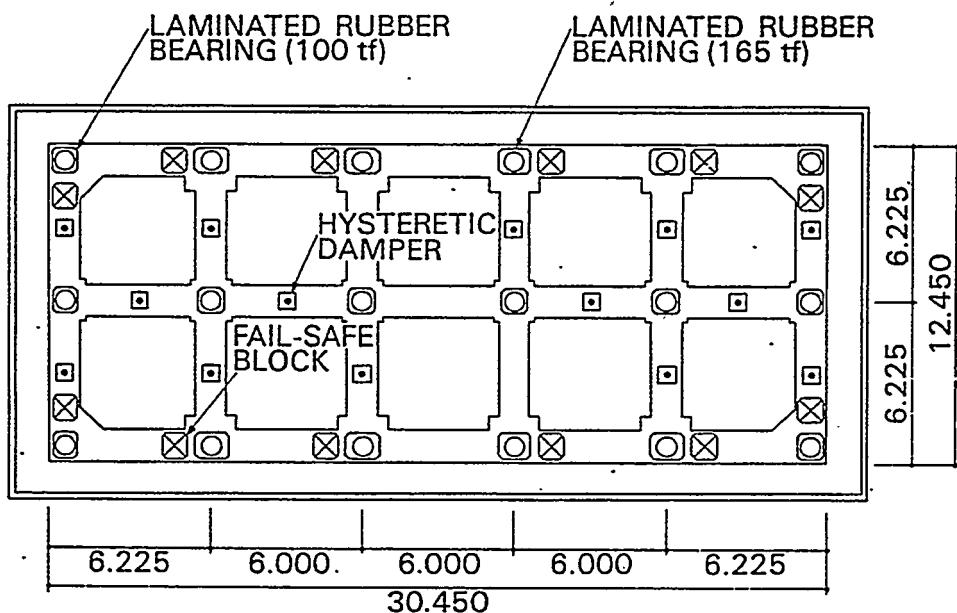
Plan of Kajima Building Showing Layout of Isolation System Components
